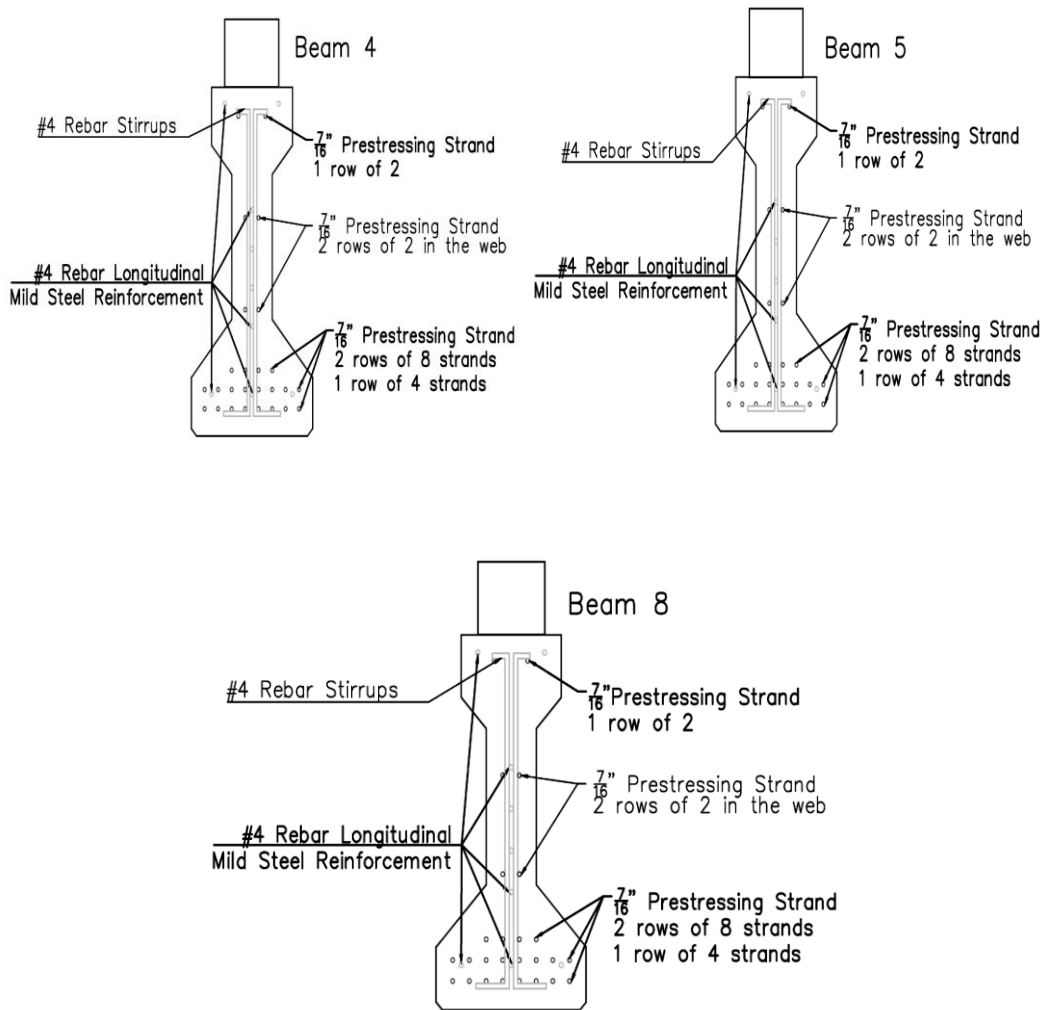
Steel reinforcement patterns for girders 4, 5, and 8, provided by the Florida Department of Transportation (FDOT)
